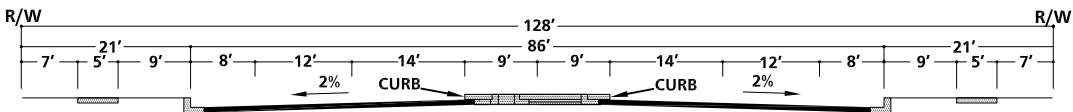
CITY OF EASTVALE GENERAL PLAN ROADWAY CROSS-SECTIONS
